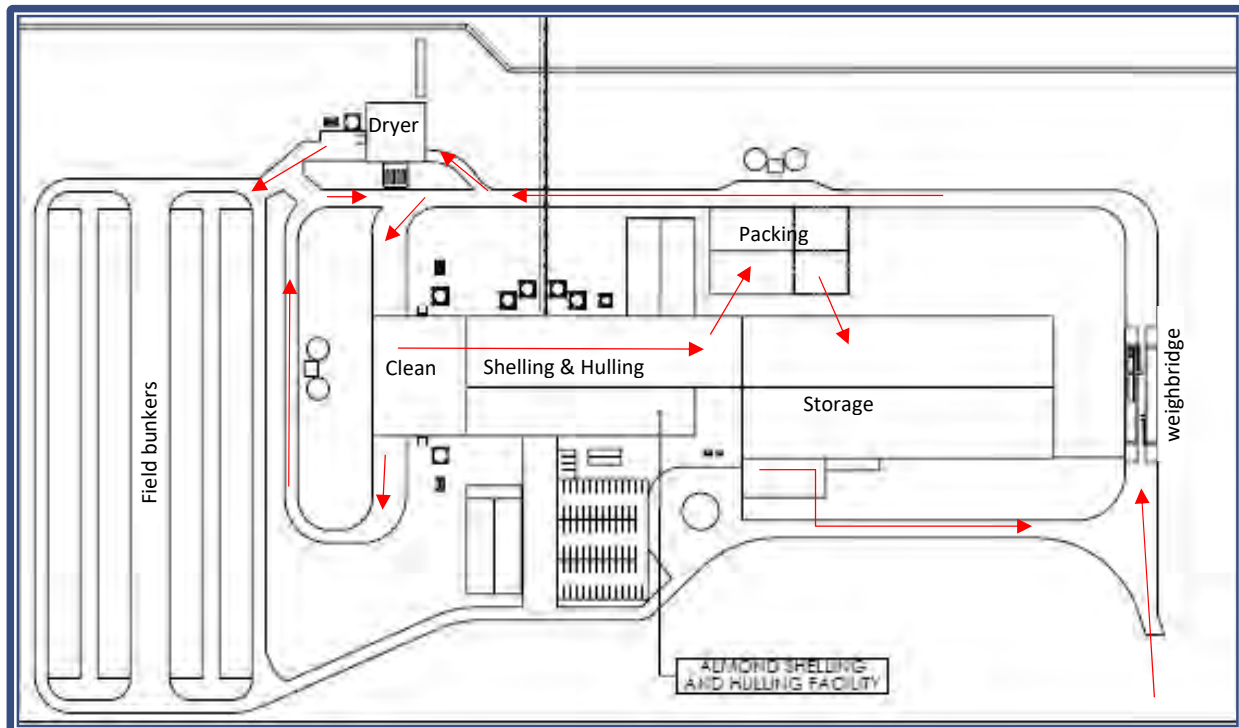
Facility Buildings with arrows showing delivery locations at the within the site (Source: JMA Engineering Plan – Sheet A102)
